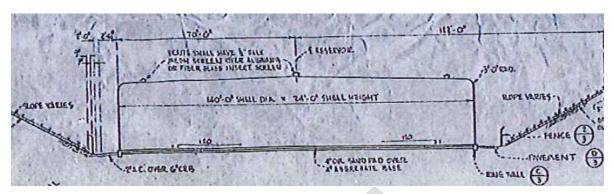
Hallmark Tank Section (Source: Hallmark Tank Site Plan)
